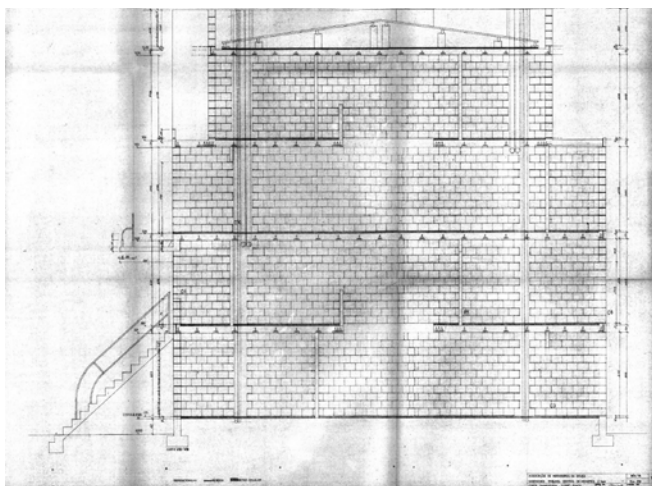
Bouça Housing Complex section with concrete blocks layout (Porto District Archive).
